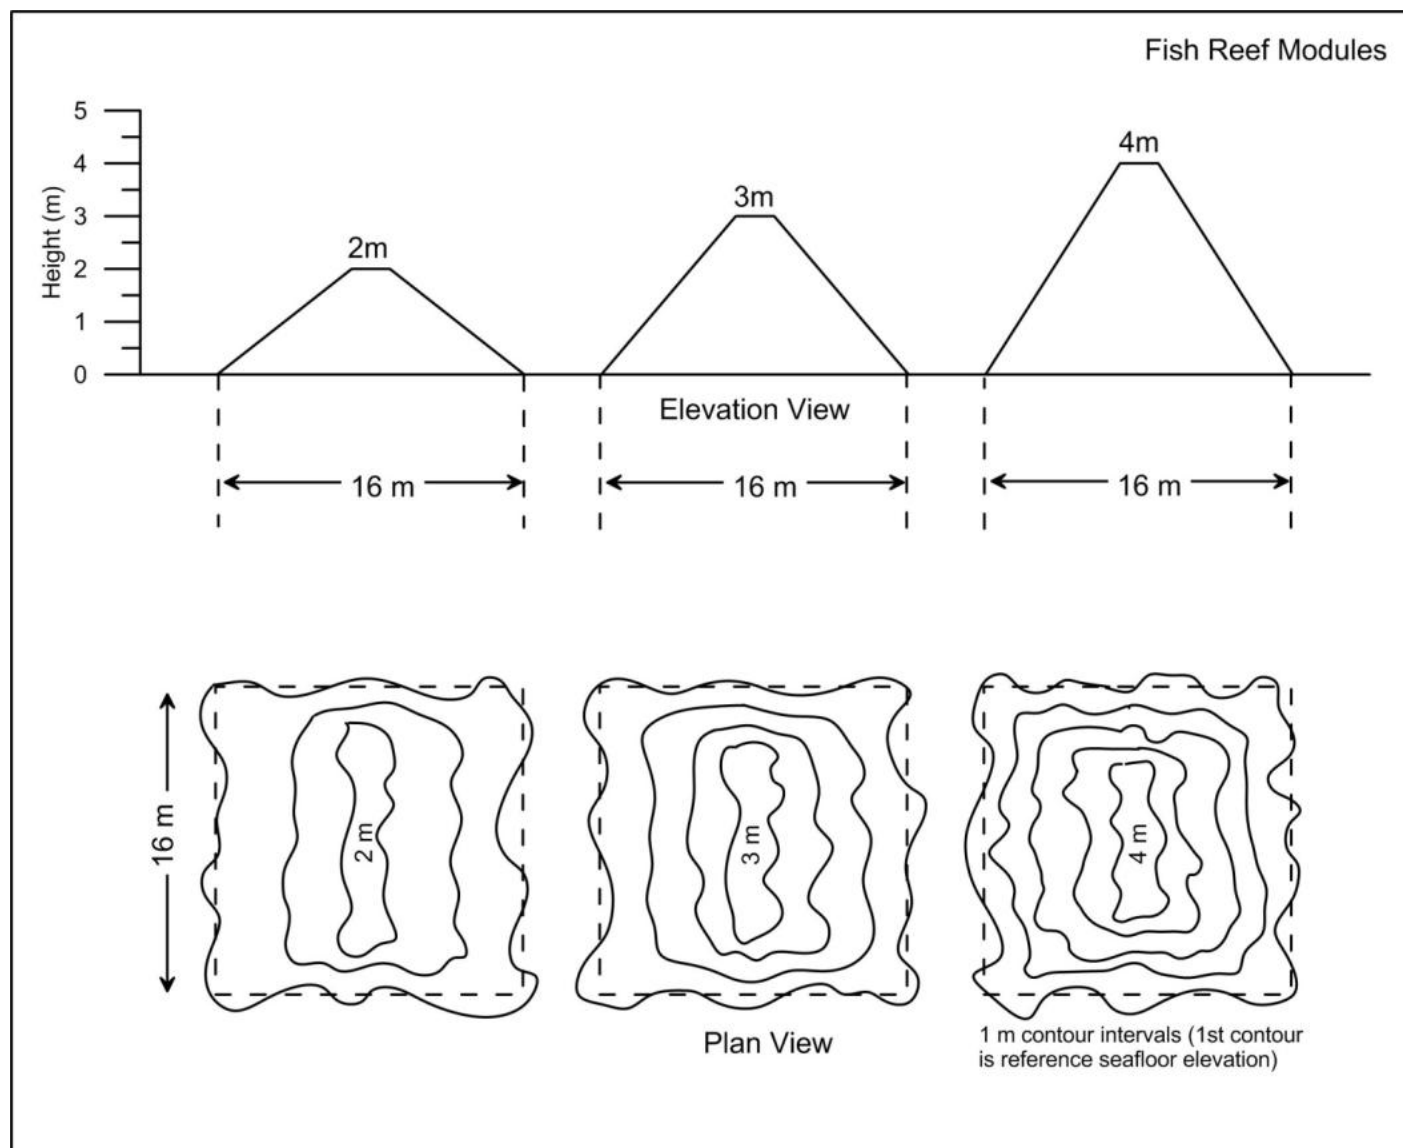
Photos and Figure of Proposed Installation Method (page 1 of 2)
